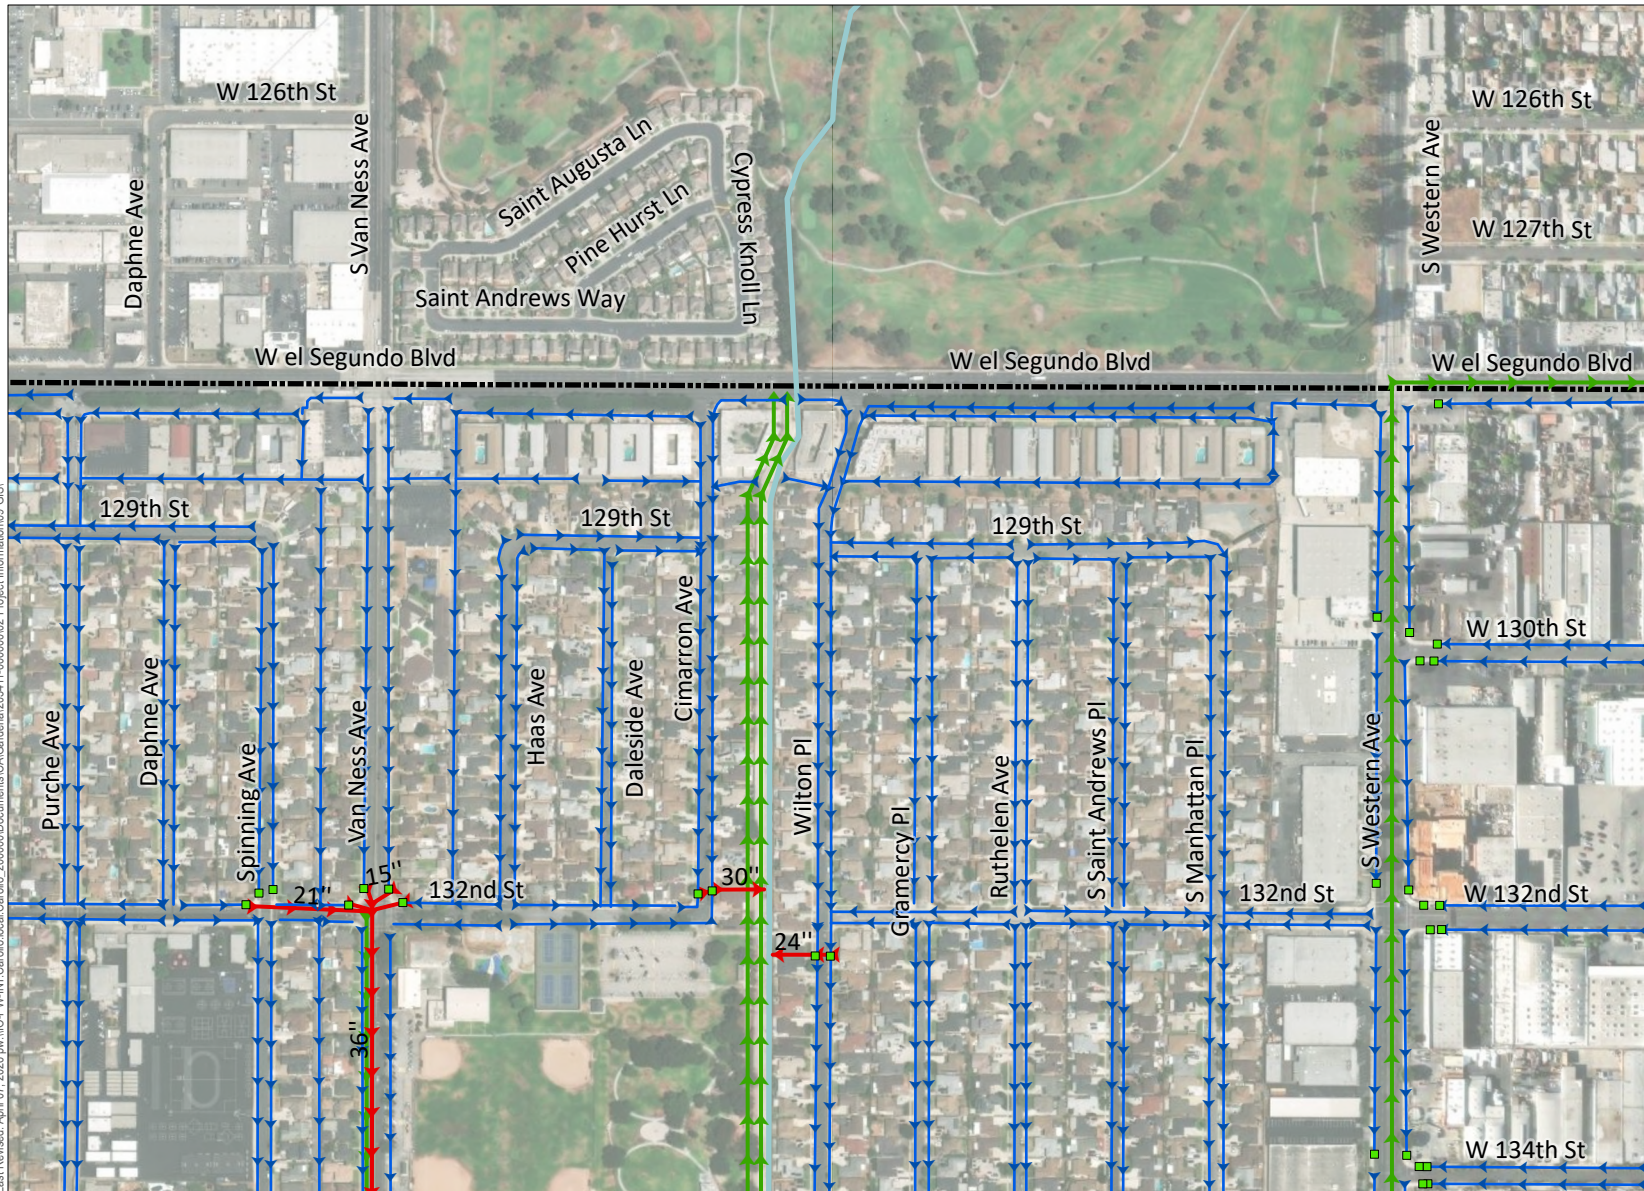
Gardena Storm Street Flows Direction with Existing System Drains
